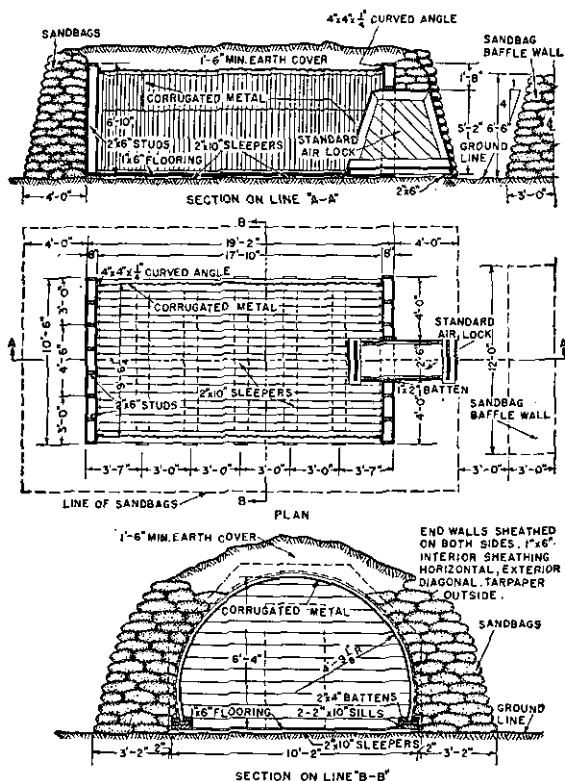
Surface shelter constructed of semicircular section of corrugated metal and utilizing sandbag blast wall.
